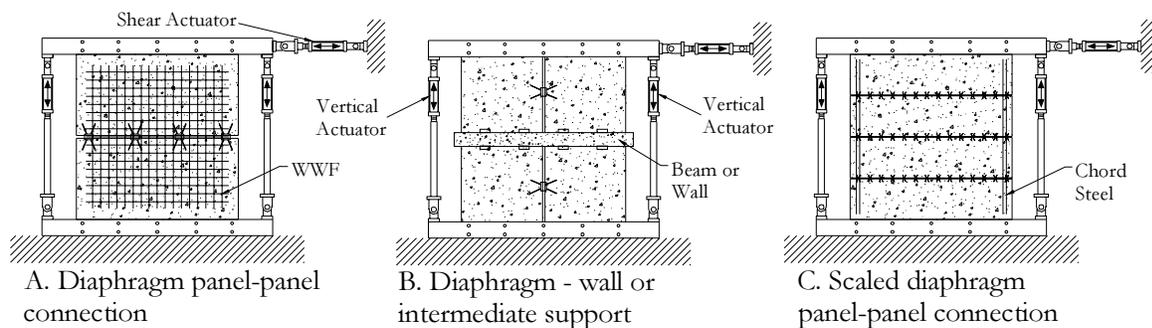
Plan views of MCD fixture showing test configurations A, B, C
